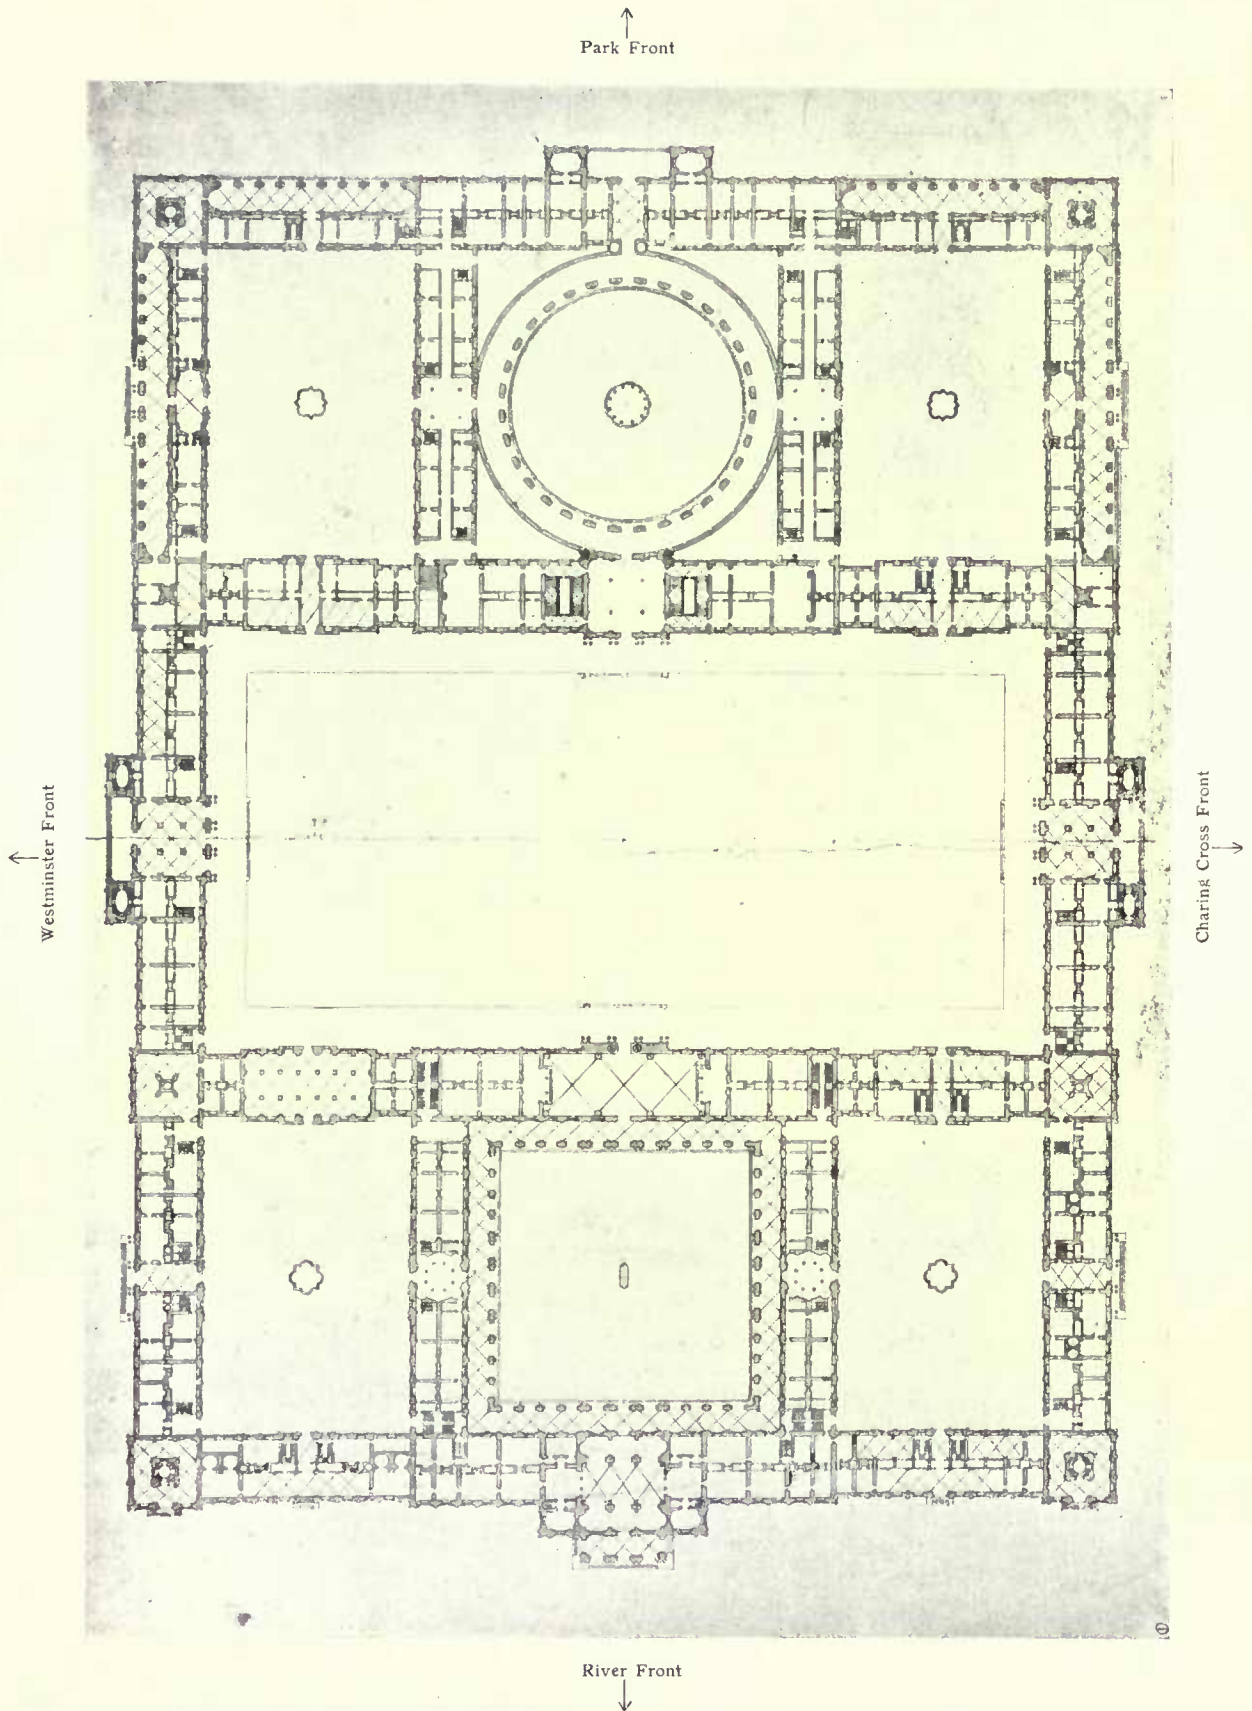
GROUND-FLOOR PLAN OF THE PALACE
